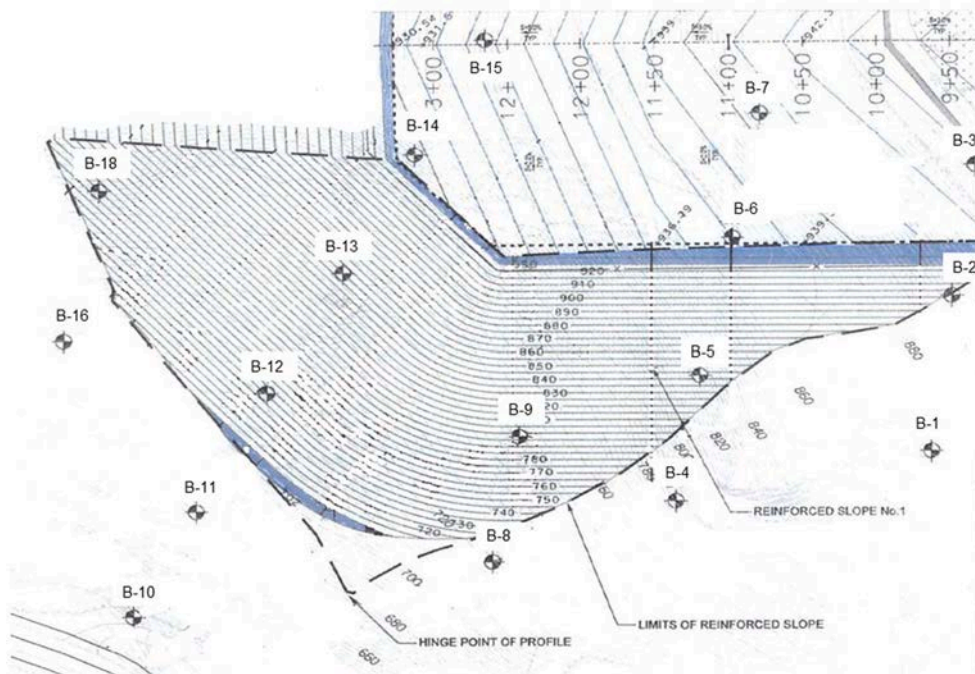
Proposed RSS plan view with planned boring locations (after Triad Engineering, 2005).
